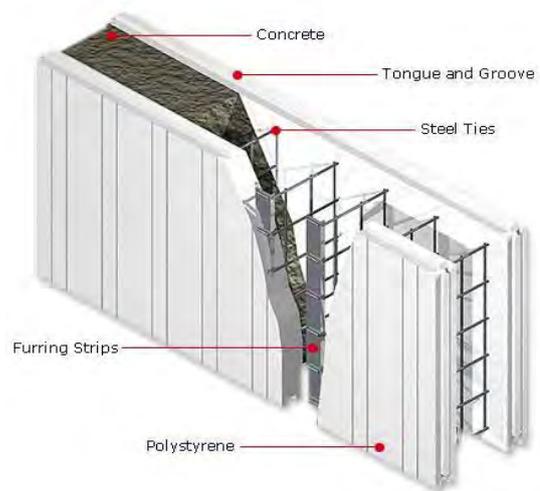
Insulated Concrete Forms are stay-in-place concrete forms
